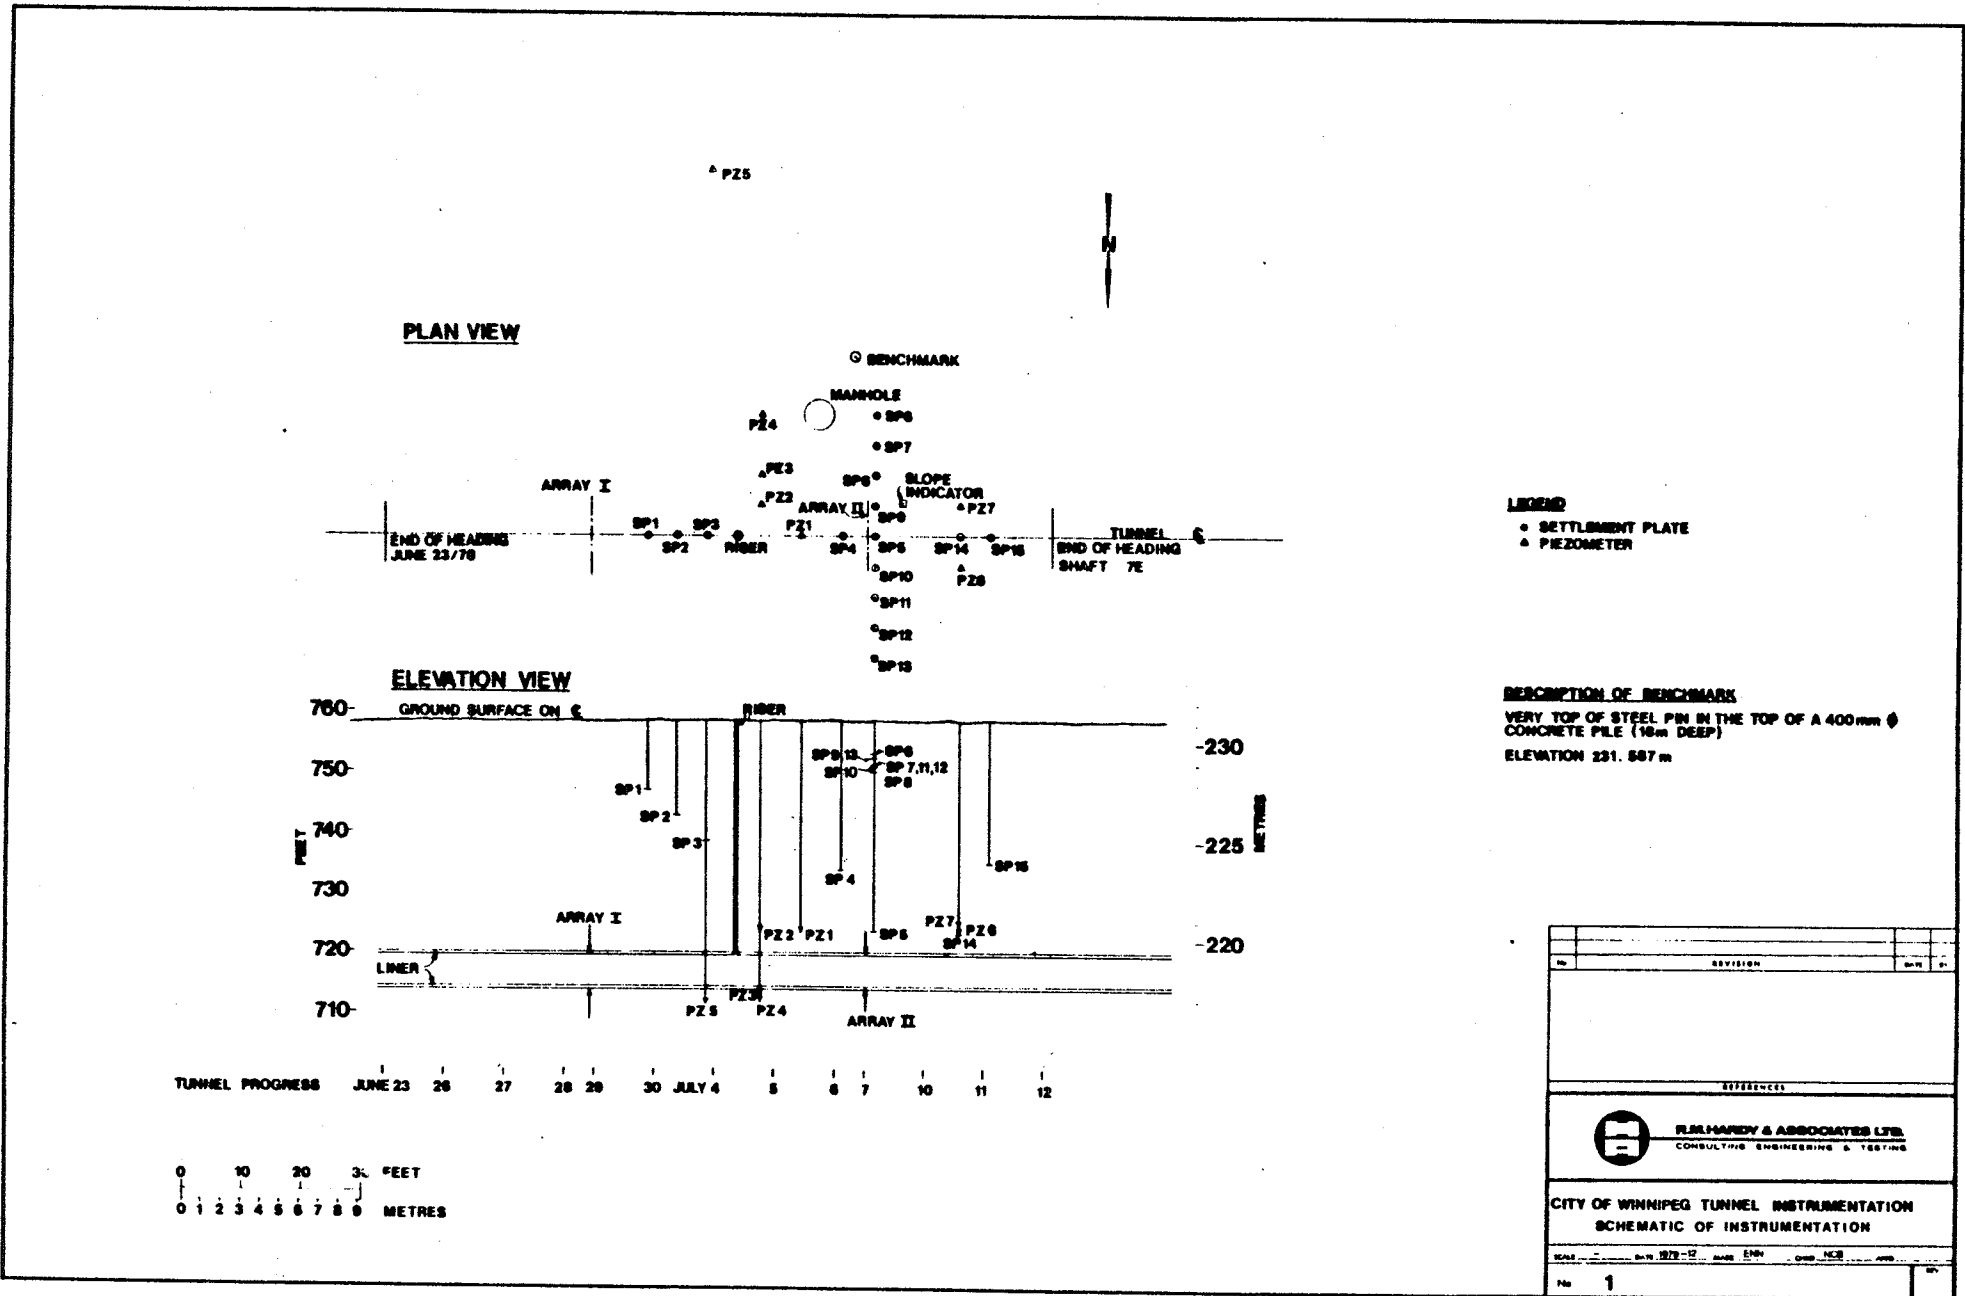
Tunnel Instrumentation Layout After Hardy et al (1981)
